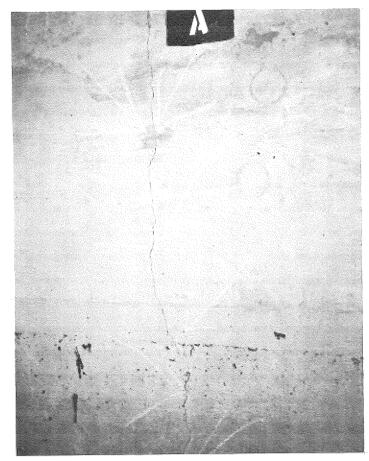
Crack in drainage inspection chamber at Station 0+70.3, January 10, 1952.
